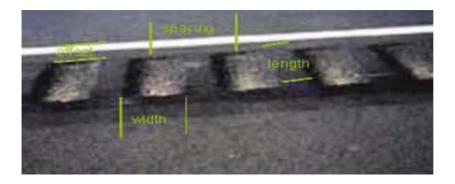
Typical milled rumble strip picture [FHWA, 2011].
